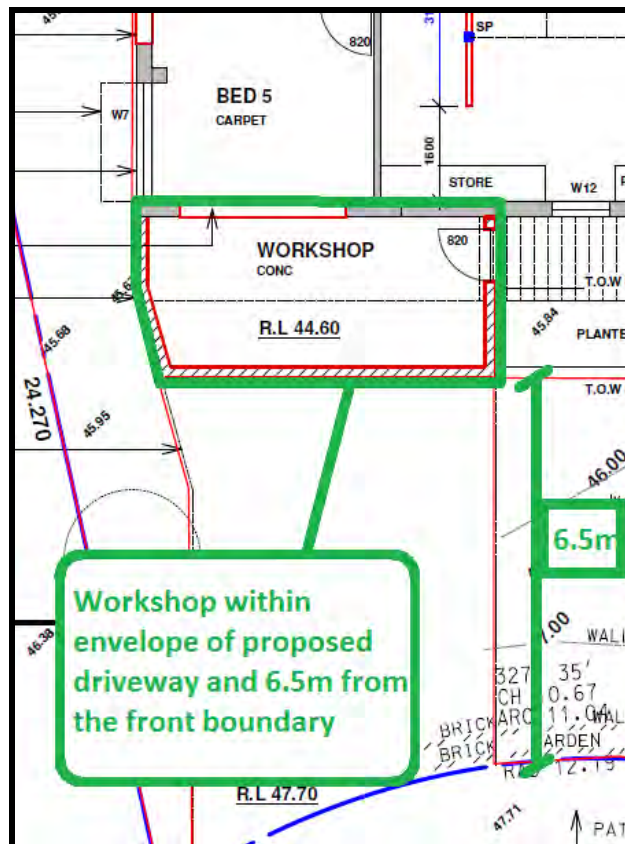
Workshop shown within the envelope of the driveway and 6.5m from the front boundary. Note that the door to workshop opens to the south and that no windows are proposed.
